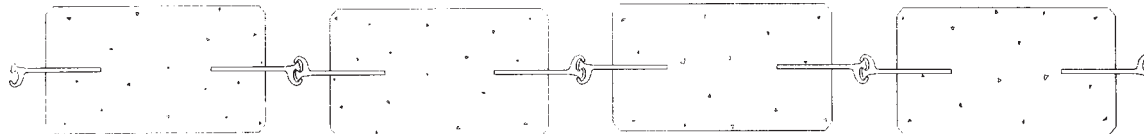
Concrete Sheet Piling with Steel Interlocks
